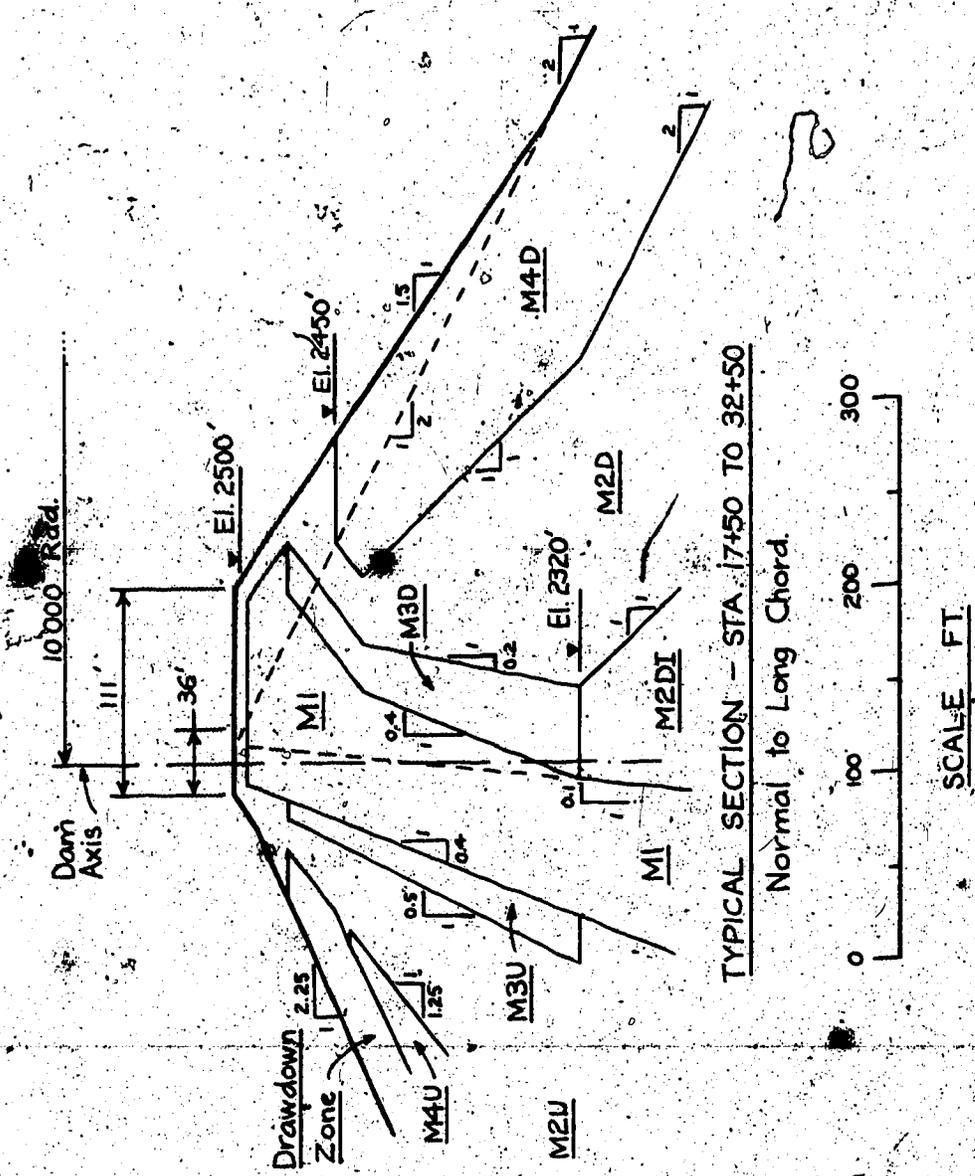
DAM CREST WIDENING DESIGN DETAILS
